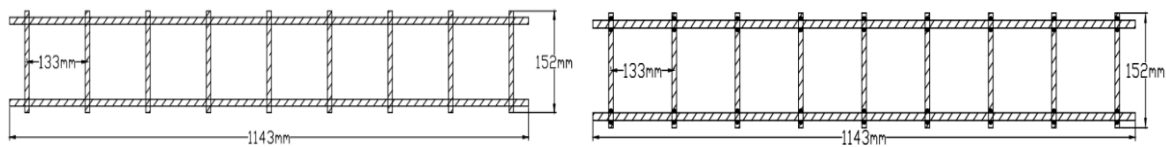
Howe truss and conventional arrangement respectively [14].
